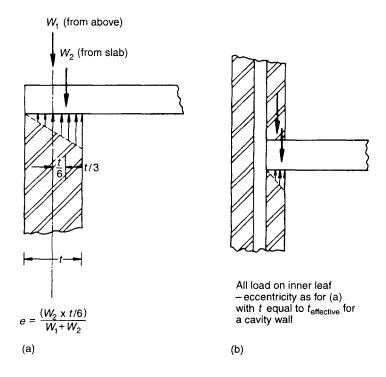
(a) Eccentricity for floor/solid wall; (b) eccentricity for floor/cavity wall.
